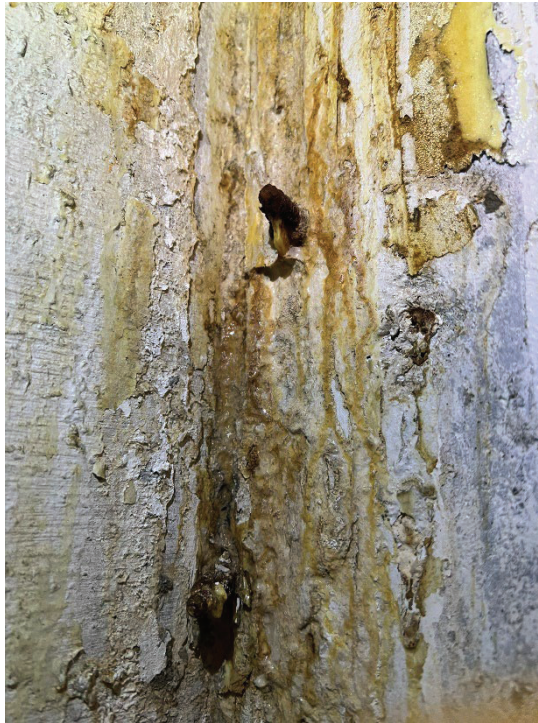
Previous Grout Injection from 2023 in South Lobby AC Unit Room (February 21, 2024).
